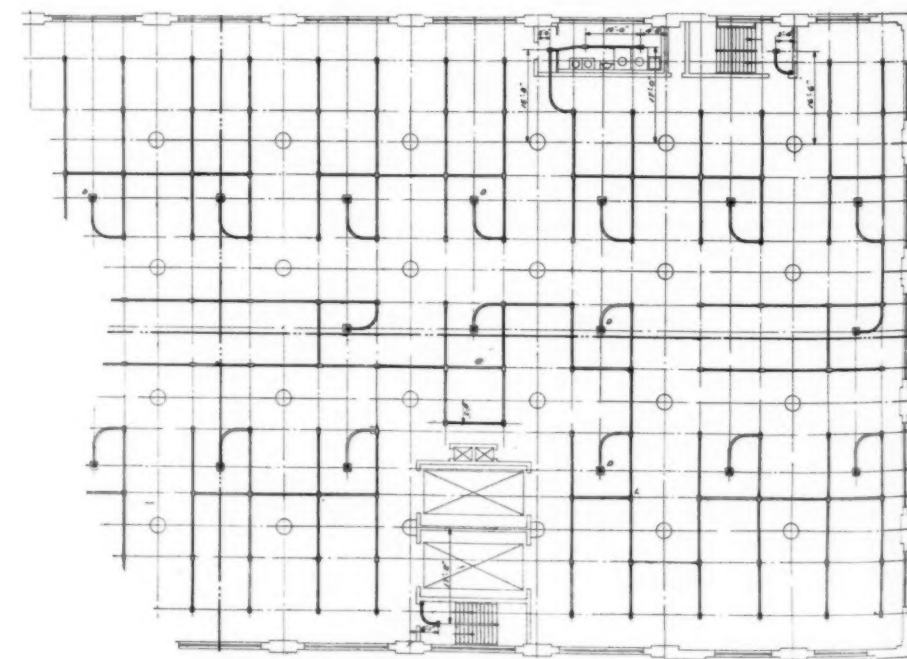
One Corner of Building Showing Layout of Conduit in Floor
